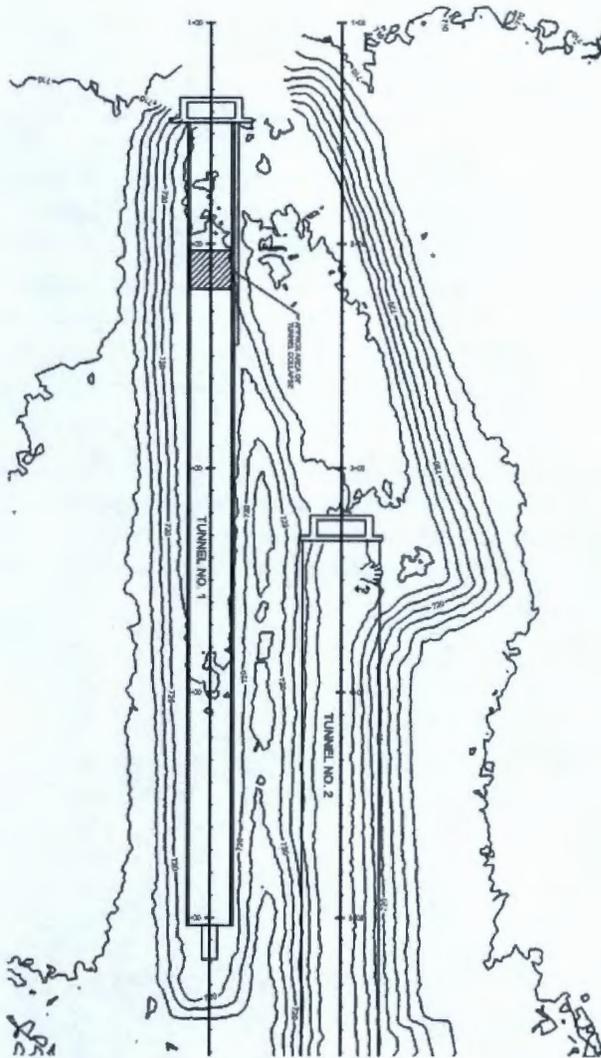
Plan view showing of LIDAR topography and as-built geometry of Tunnel 1. North is up.
